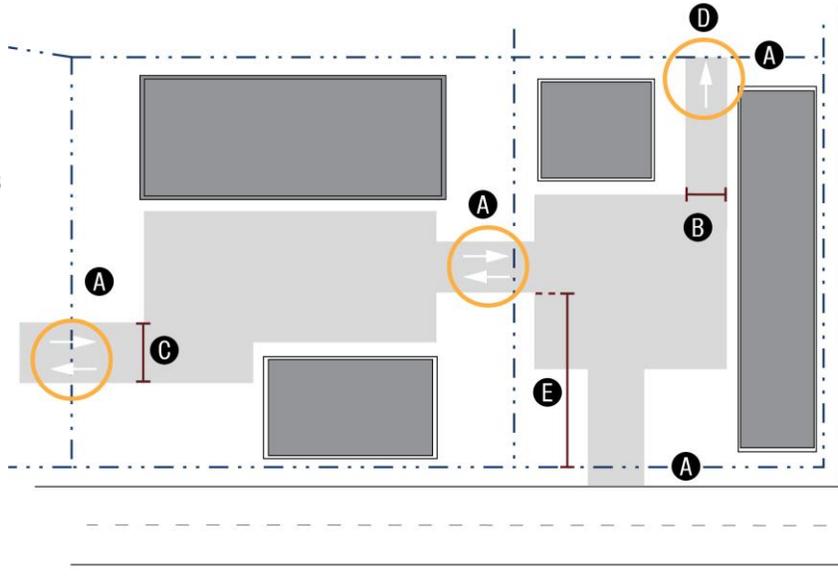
PARKING LOT CONNECTIONS
